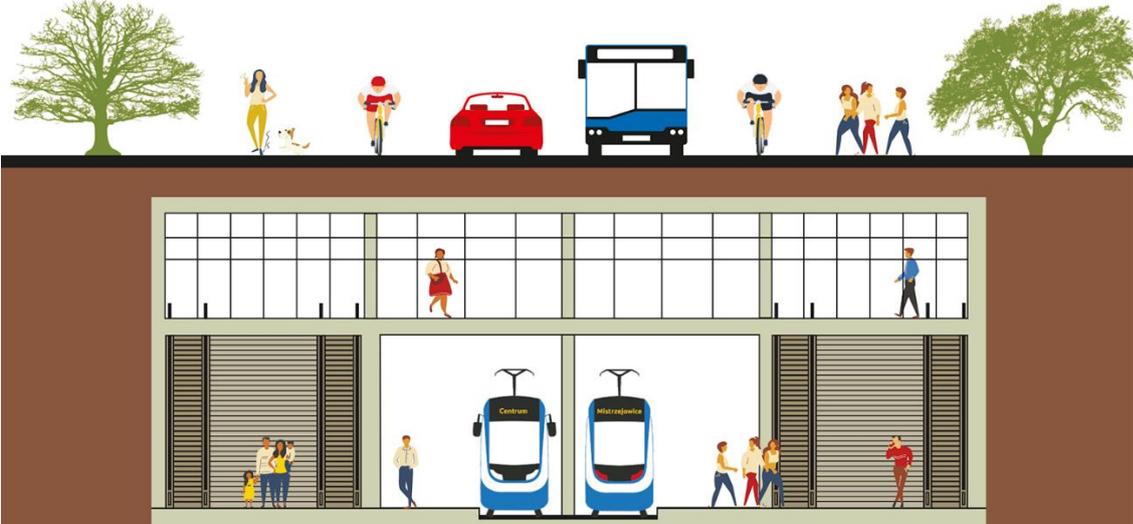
Underground tram stop in Polsad roundabout tunnel, source: Gülermak Project presentation
